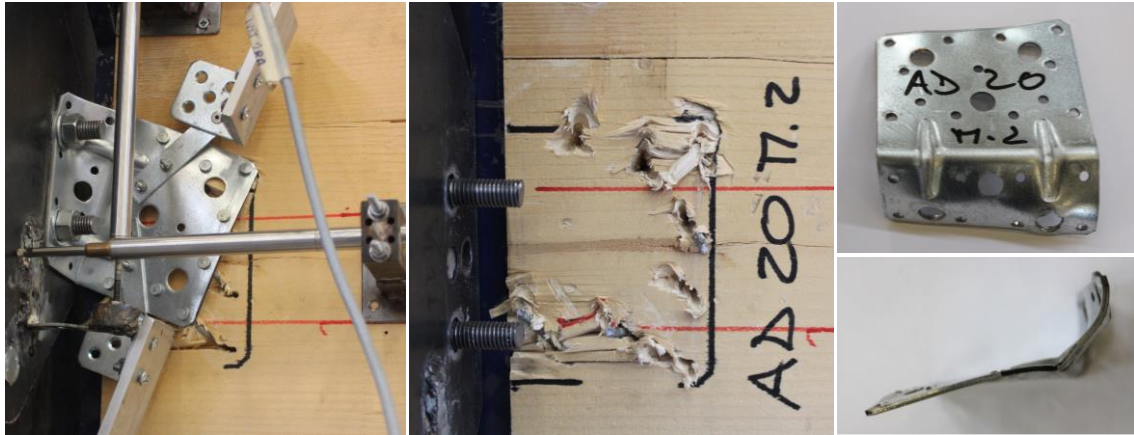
Failure of the connection with consequent embedment in the panel and deformed steel bracket
